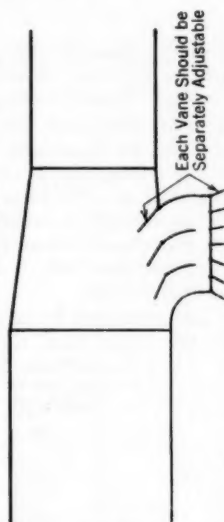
PLAN OF IMPROVED DUCT BRANCH
